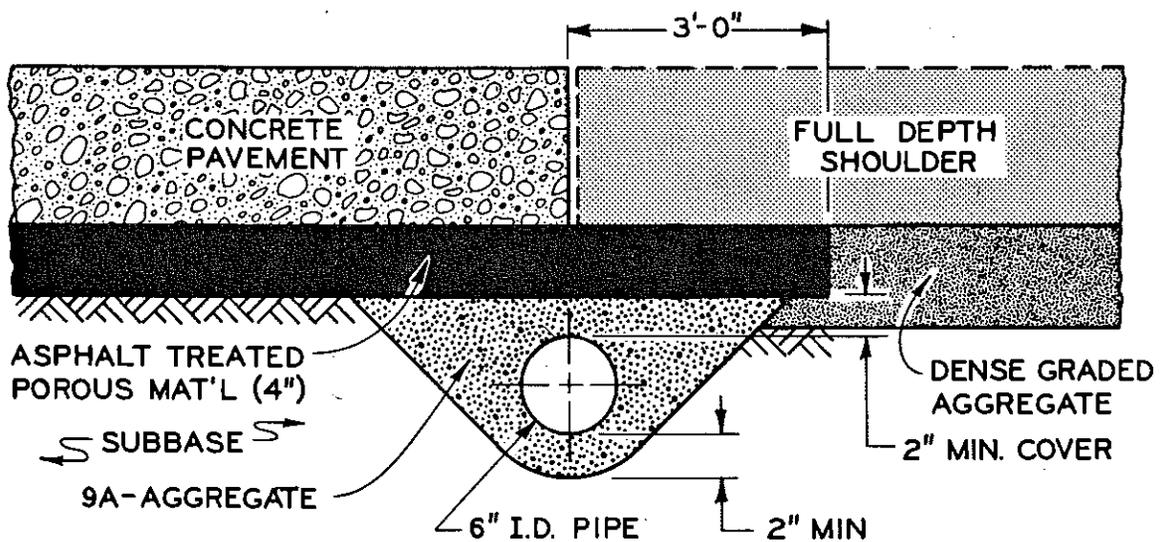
Cross-section of asphalt treated porous material (ATPM) drain installation.
